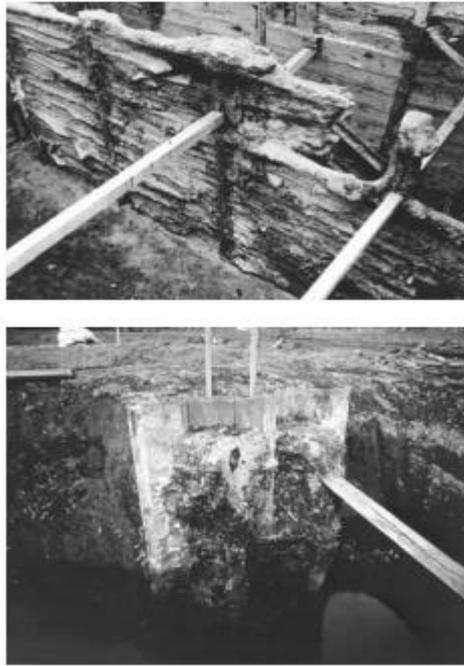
Exposed jet grout panels (Moseley, M., P. and Kirsch., K., 2004)
